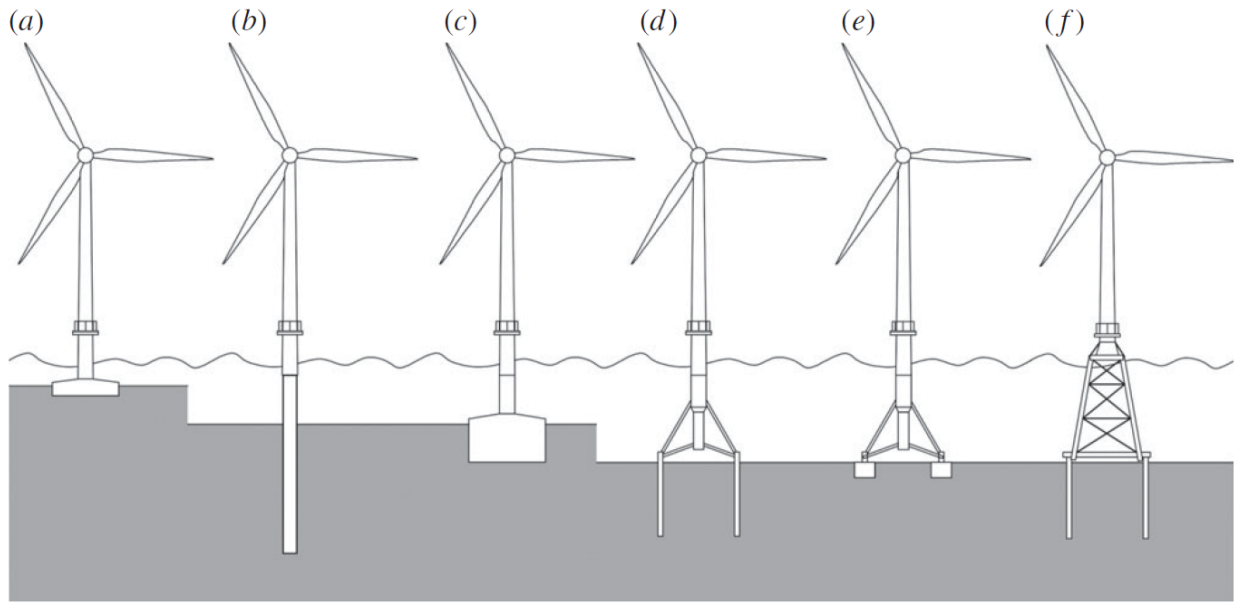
Foundation concepts of offshore wind turbines. (a) gravity based foundation, (b) monopile foundation, (c) caisson foundation, (d) multipile foundation, (e) multi caisson foundation and (f) jacket foundation. (Kallehave et al., 2015)
